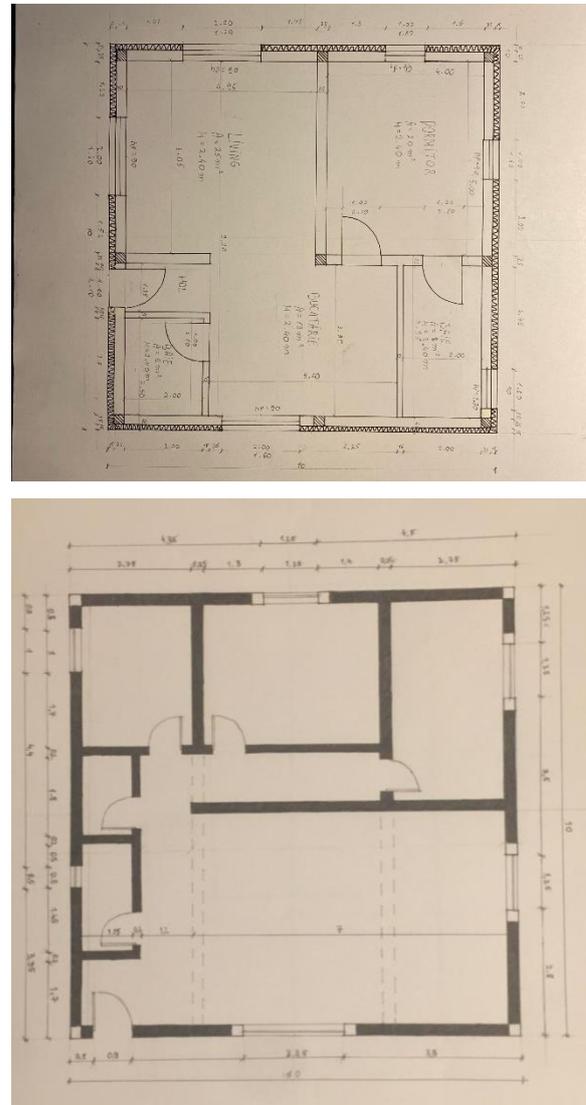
Photos with the drawings of the load bearing masonry structural system.
